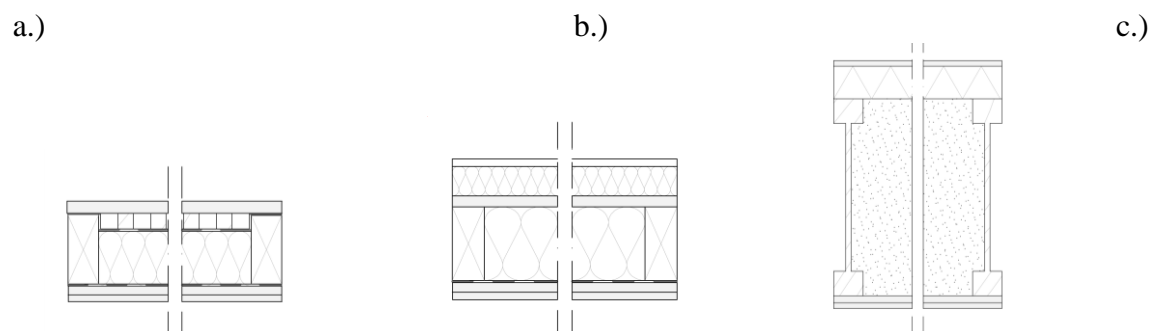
a.) Single-panel system (TFCL2); b.) Renovated single-panel system (TFCL 3), c.) Timber-frame wall element with I-studs (TF 3).
